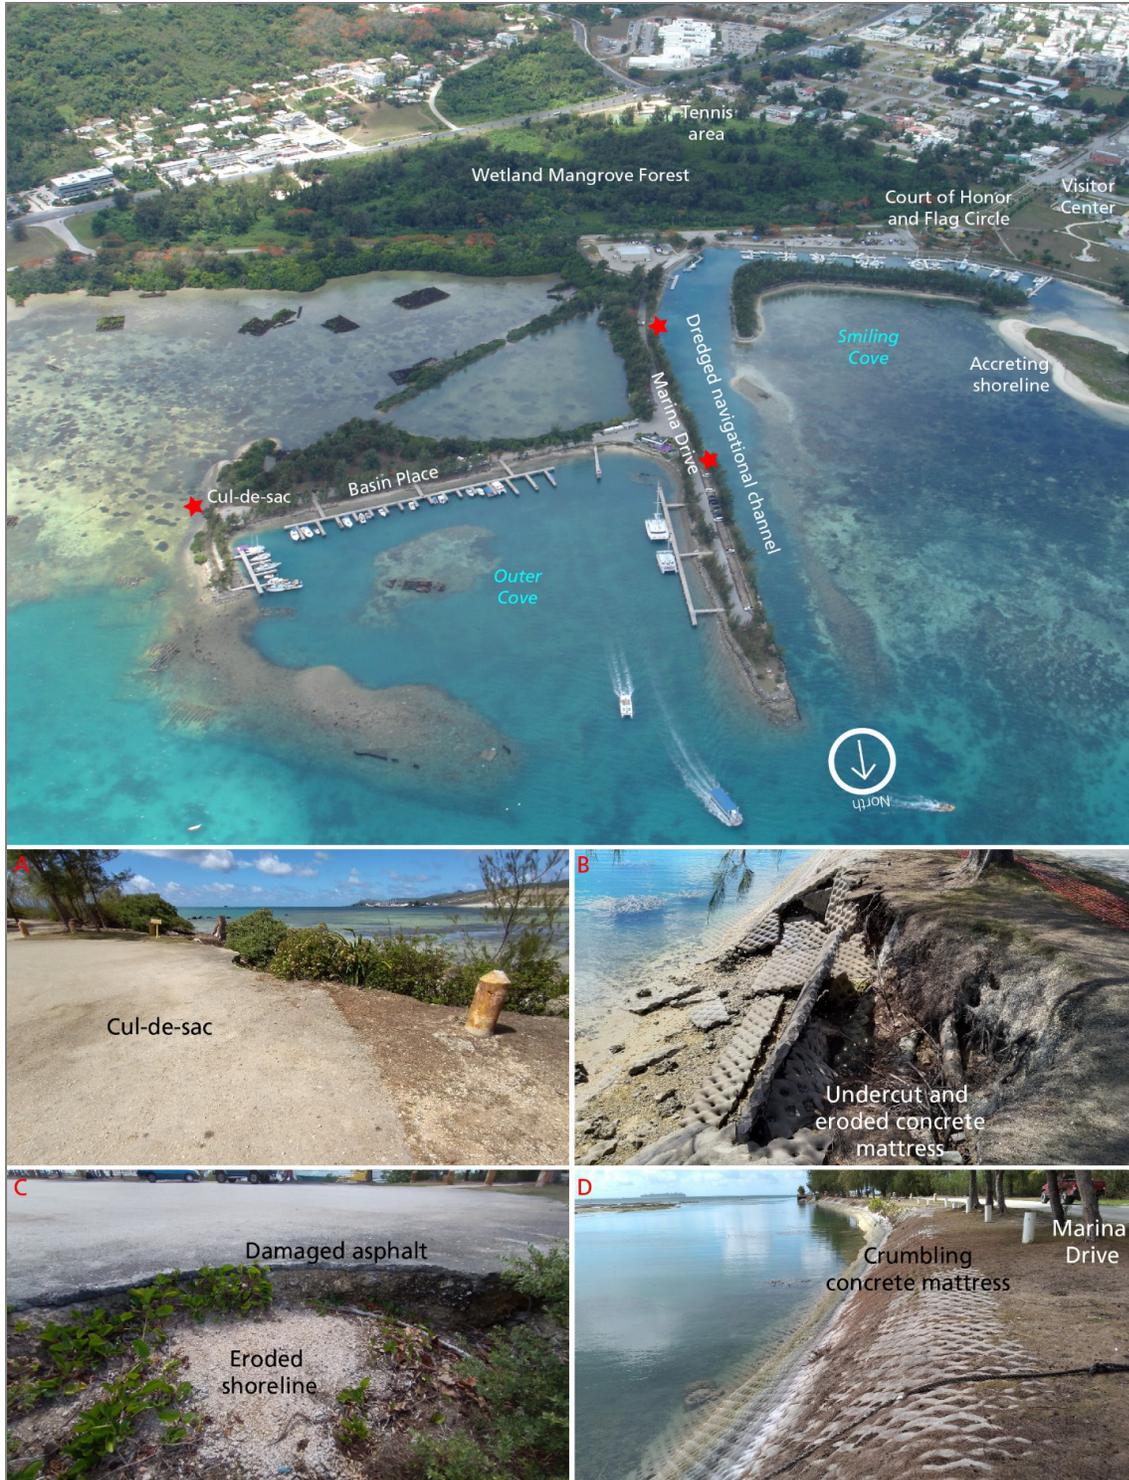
Photographs showing the restoration sites along Basin Place and Marina Drive. These roads are used to access Outer Cove and Smiling Cove marina areas. Shoreline erosion has undercut the concrete mattresses, revetments, and roadways and are now targets for restoration projects at the park. Red stars denote project areas (top photograph). Photographs are (A) photo 4, (B) photo 20, (C) photo 3, and (D) photo 26 from GHD (2020), composition and annotation by Trista L. Thornberry-Ehrlich (Colorado State University).
